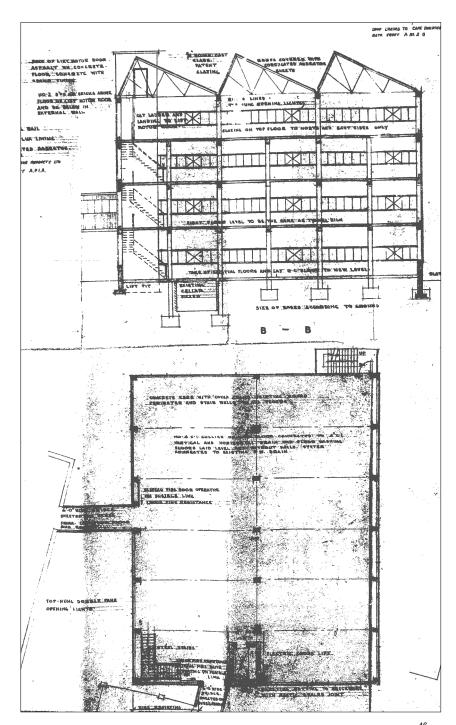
Building W1. Top: south elevation. Bottom: first floor plan. 46
